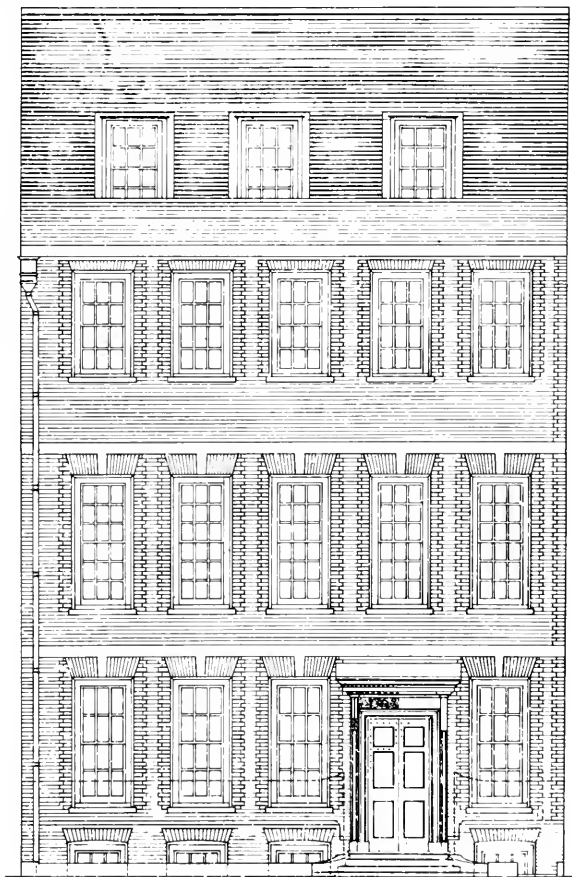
No. 44 Great Ormond Street, London, from Small and Woodbridge, p. 128.
